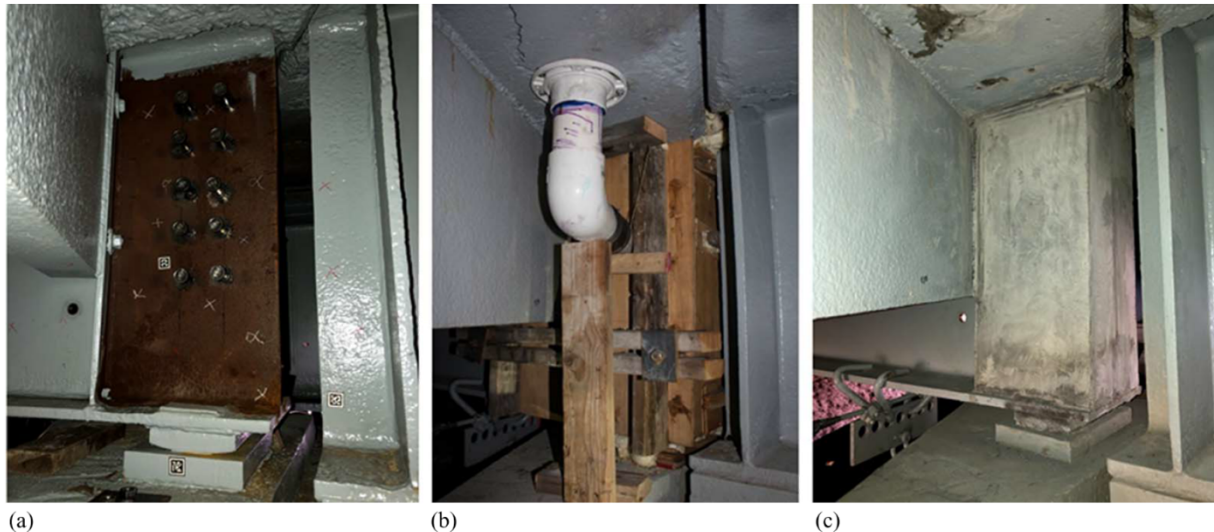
Use of UHPC for the repair of deteriorated bridge girder ends in Connecticut in 2019: (a) girder end preparation; (b) formwork; and (c) completed repair. (Images by Arash Zaghi.)
